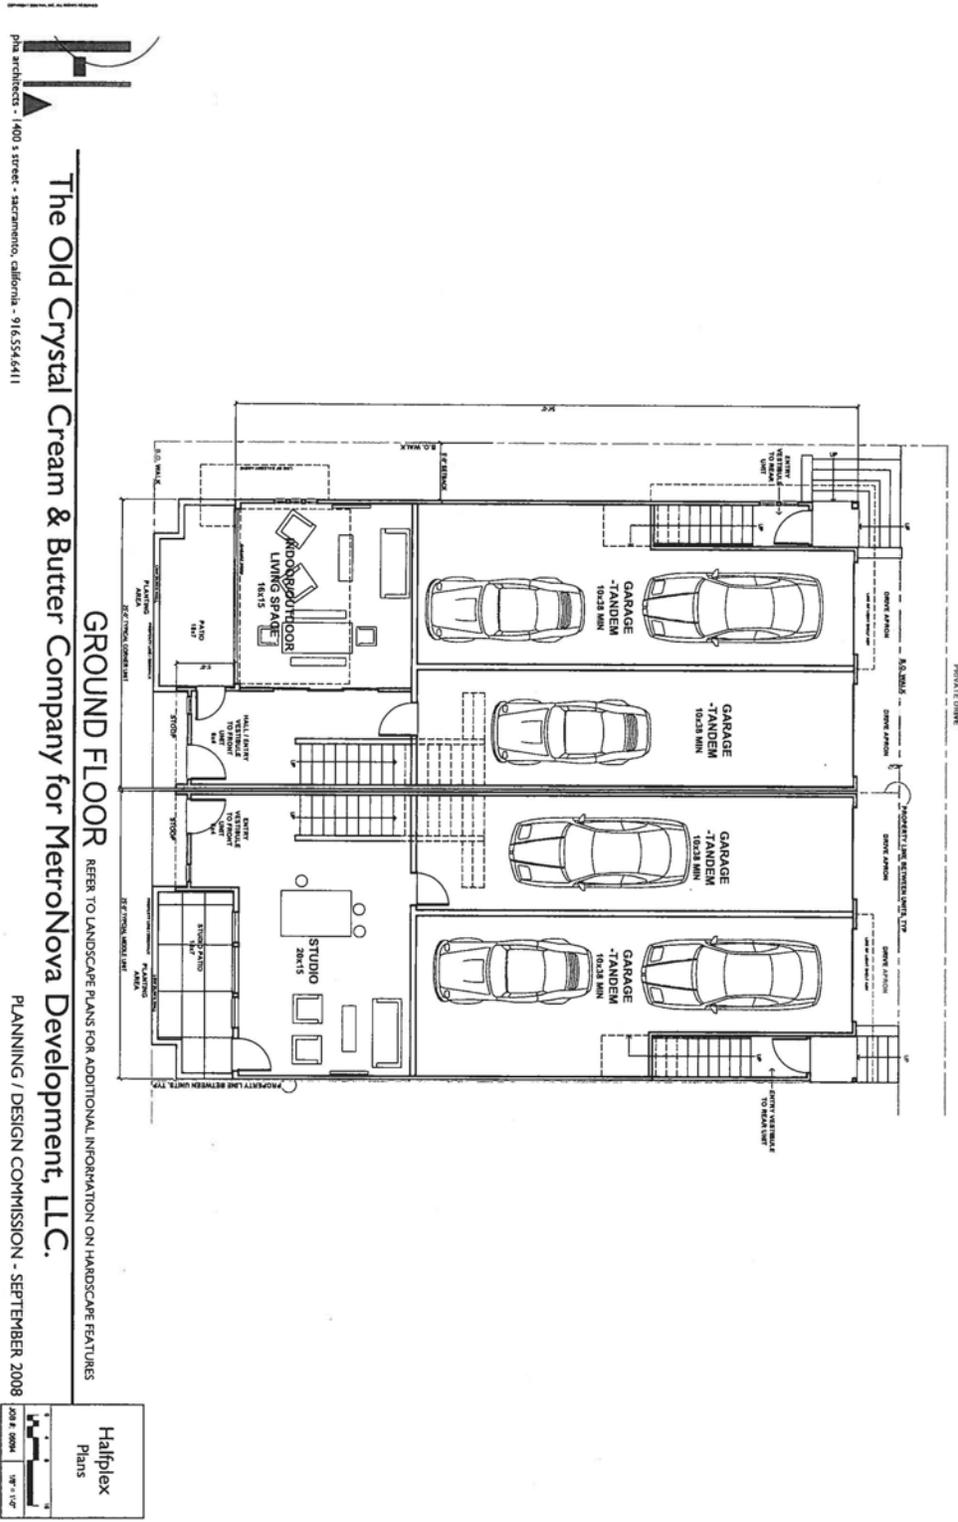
Exhibit TT: South Block: Halfplex (Lots 9-10) Ground Floor Plan
